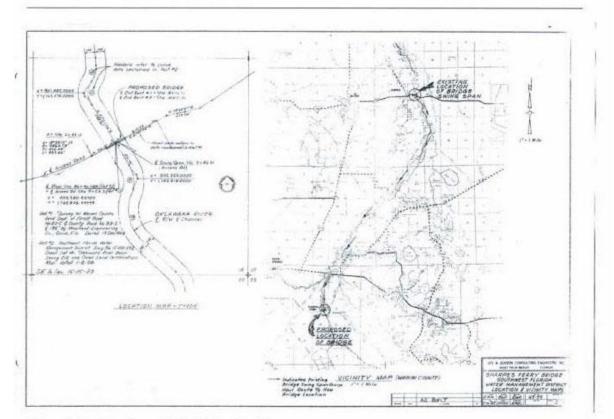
Sharpe's Ferry Bridge Relocation Plans
